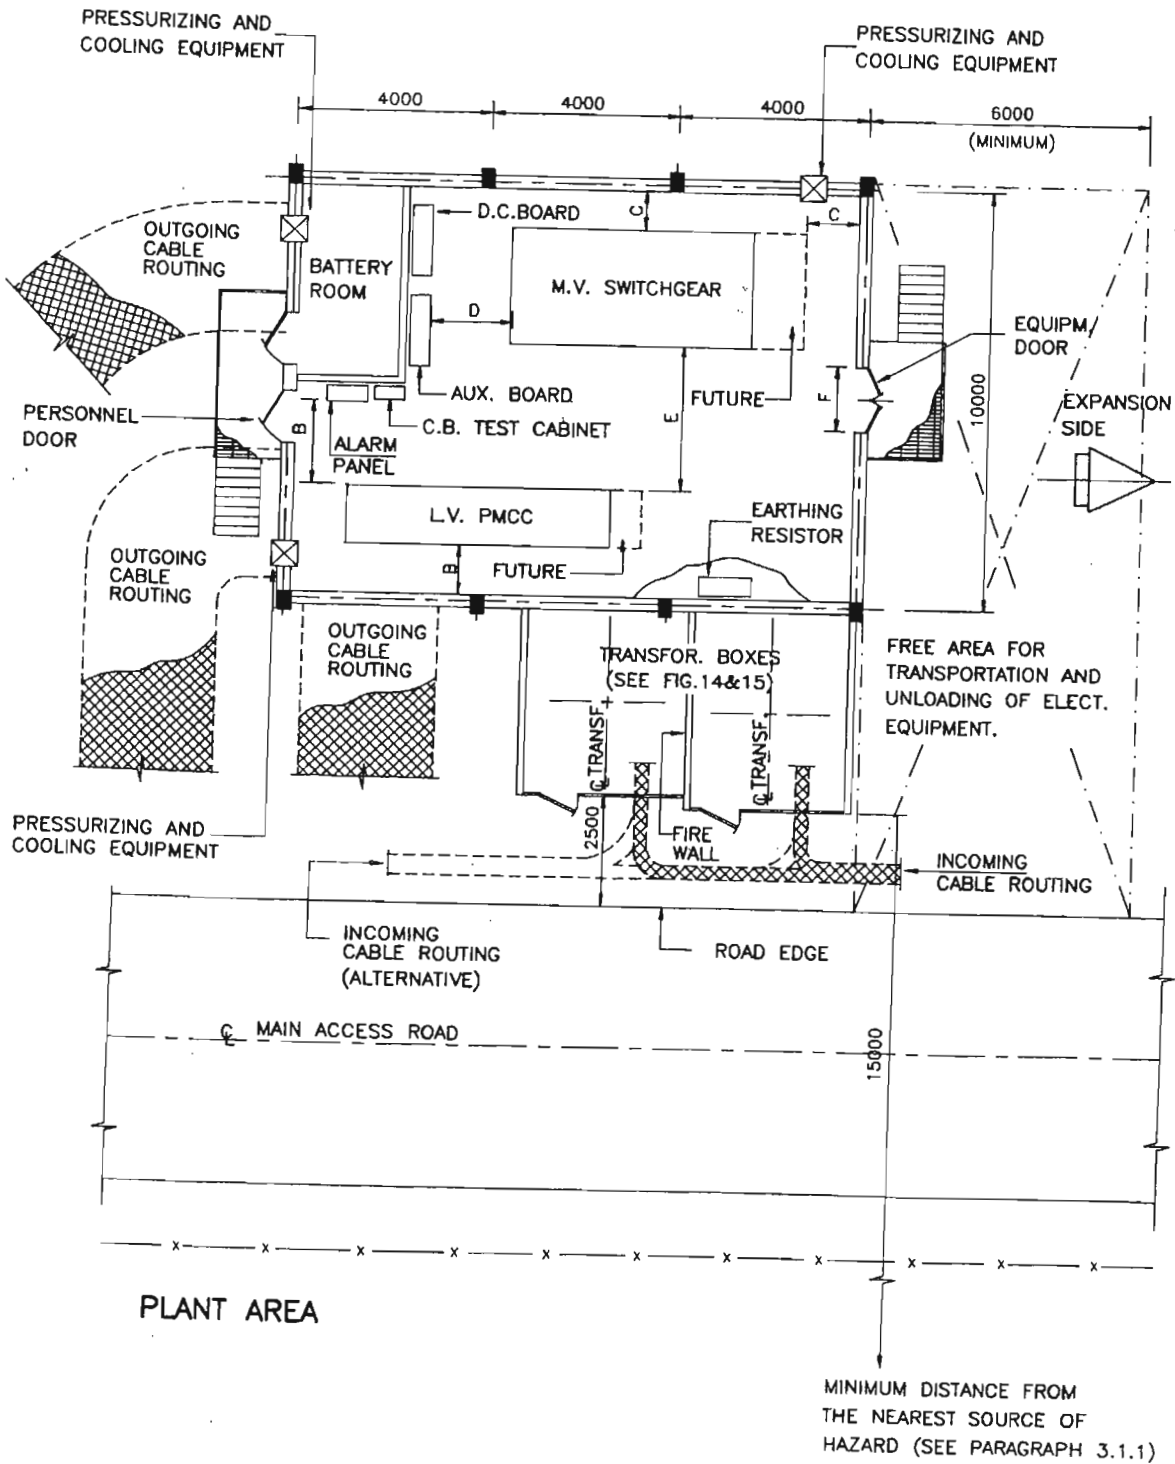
LAYOUT–L.V. DOUBLE ENDED SUBSTATION
